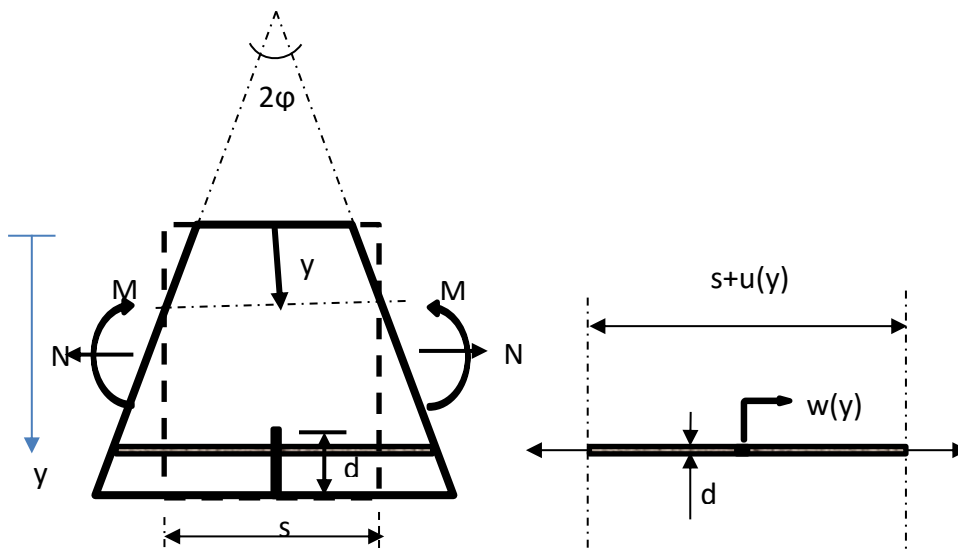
Geometry, Loading, and Deformation of Cracked Incremental Horizontal Strip of Hinge
